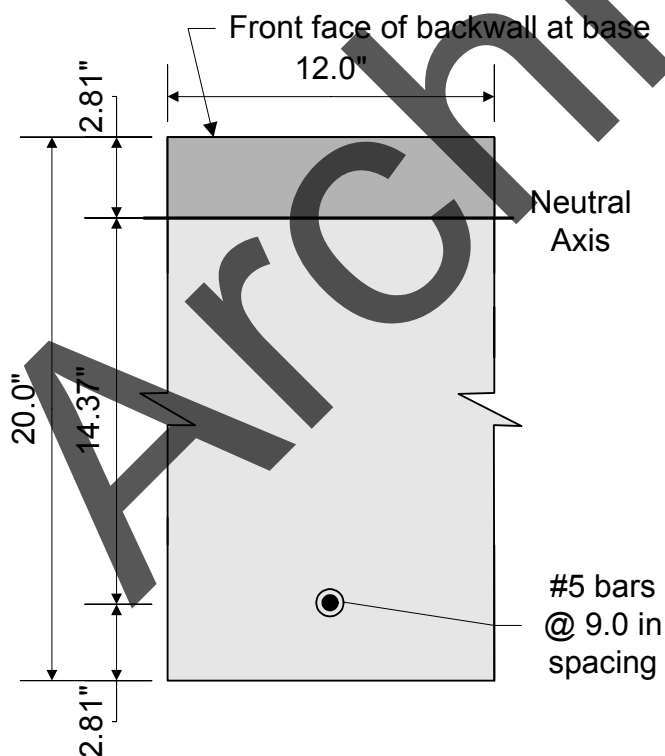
Abutment Backwall Crack Control Check
